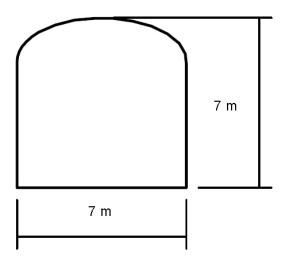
Cross-section of transport tunnels (according to /SKB 2002/).
